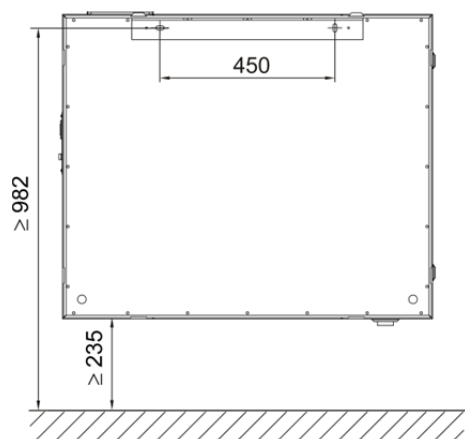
Horizontal wall mounting (HORIZONTAL - RIGHT version)
